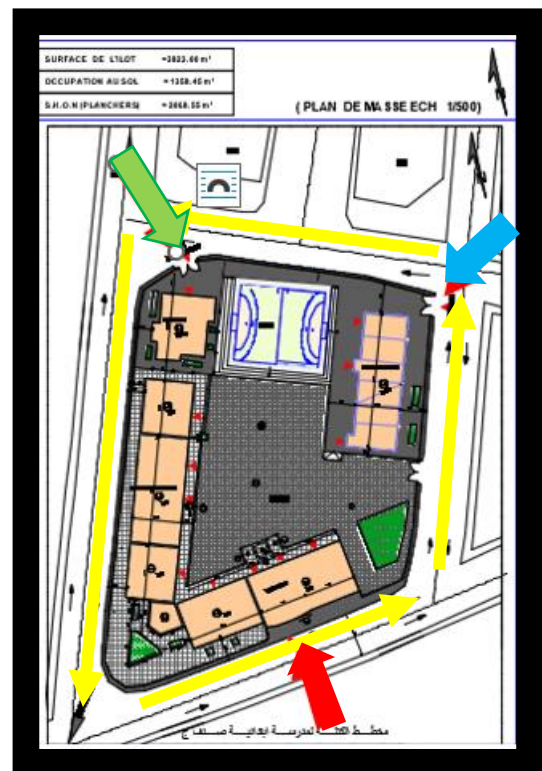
project entrance ,Source:massing plan adapted by the author 2025
